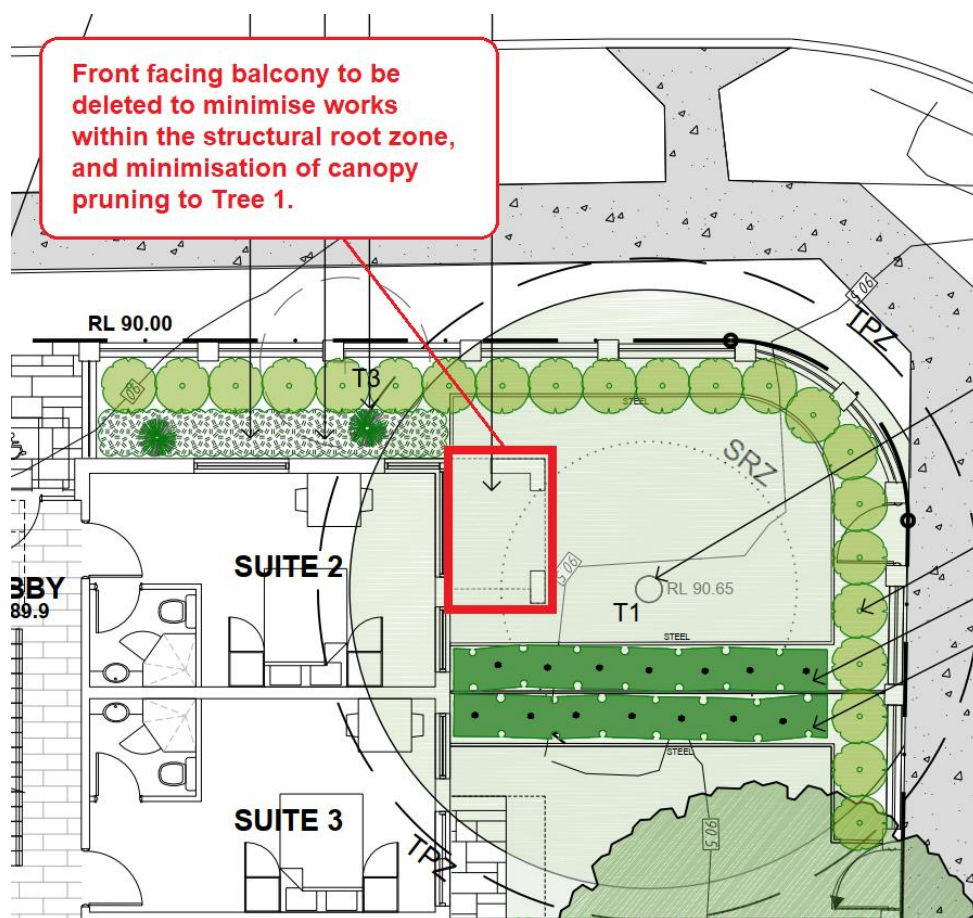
The front facing balcony is to be deleted by way of condition to ensure works within the structural root zone of Tree 1 are avoided. Further, by removing the balcony, canopy pruning to Tree 1 will also be minimised. Source: Landscape plan submitted by the applicant.
